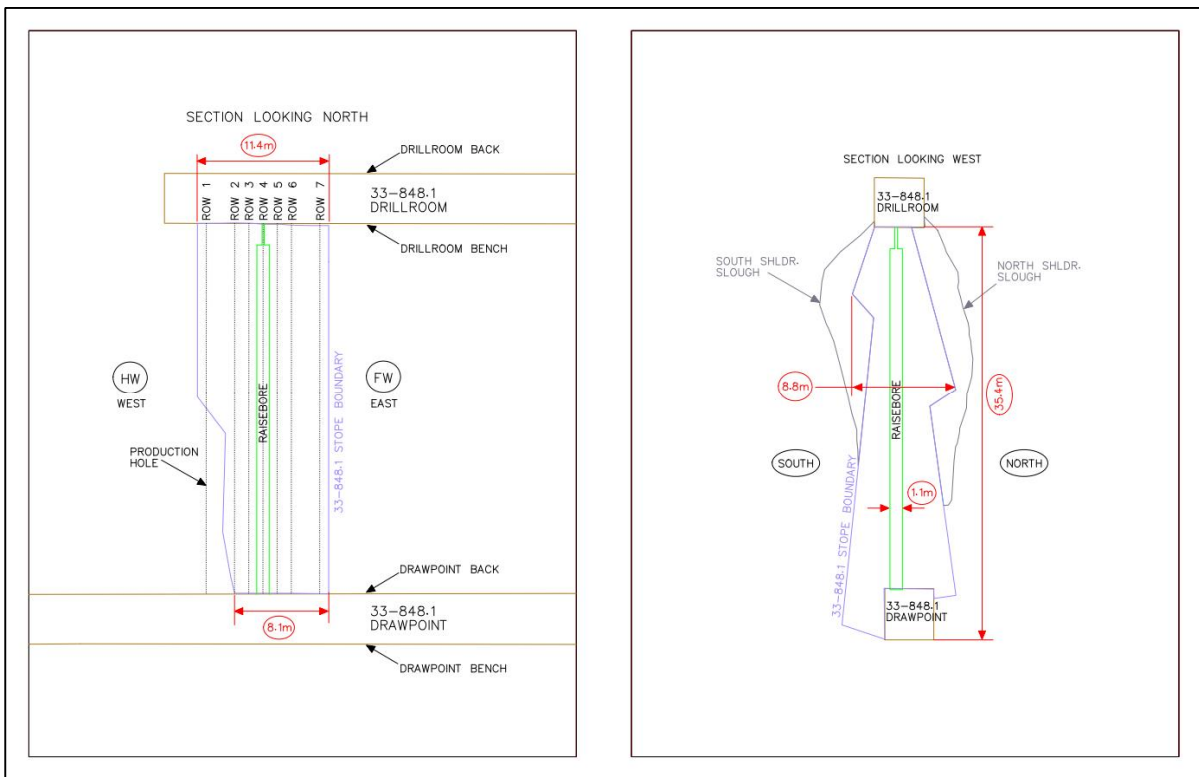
Longsection and cross-section of the 33-848.1 slope
